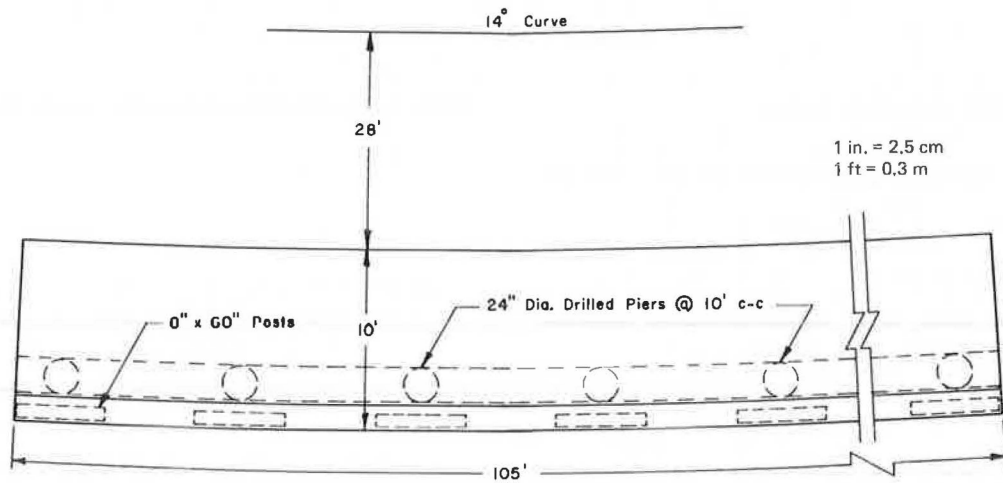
Plan view of modified T5 bridge rail, bridge deck, and pier system.
